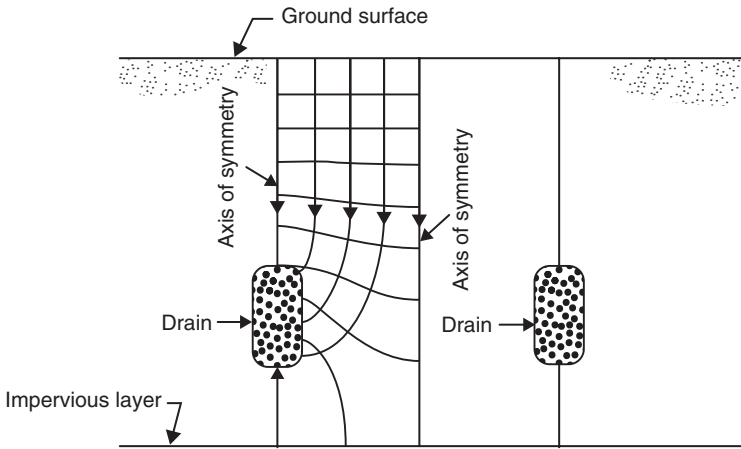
Schematic of slope stabilization using geofabric-wrapped drains (adapted from Broms and Wong, 1986)
